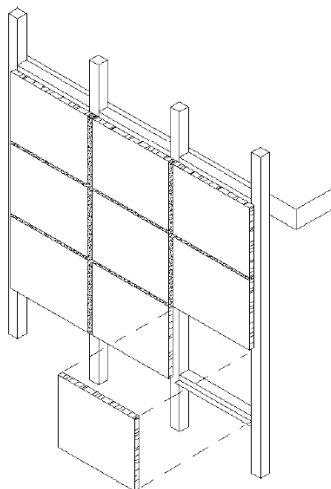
Structurally sealed system curtain walling: schematic drawing (Umberto GALLI, 2011)
